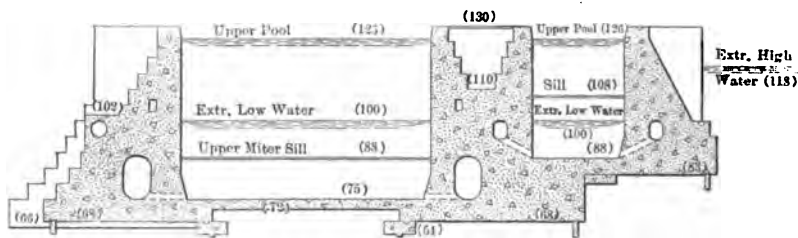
LAKE WASHINGTON CANAL LOCK, CROSS-SECTION.
